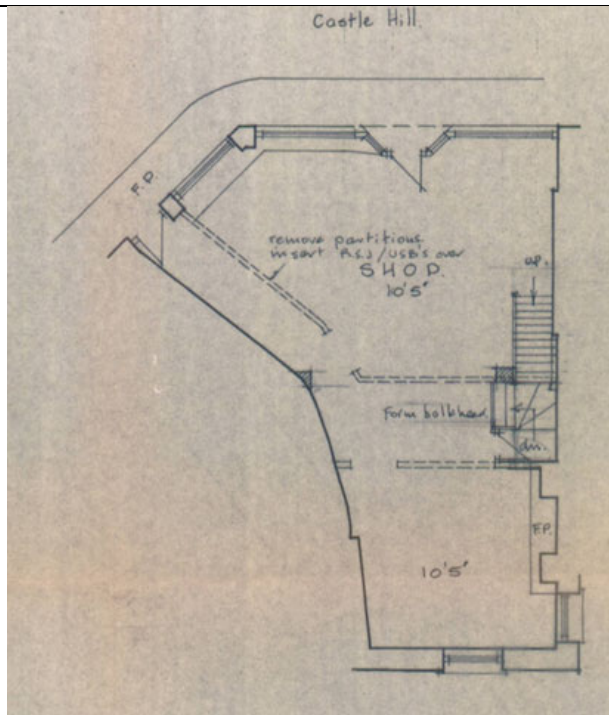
Ground floor layout approved under NE 831 and remaining today
